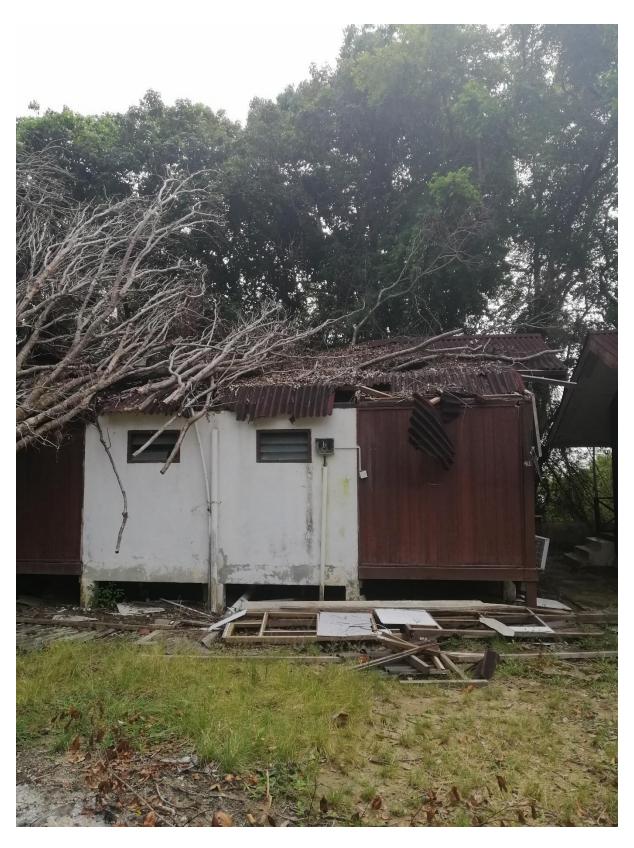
Damaged chalet roof because of fallen tree due to storm.
